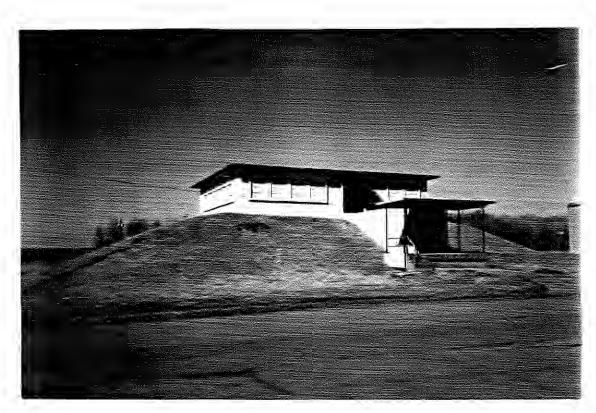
SEAD-72, 4-4-94. View of Building 803, the Mixed Waste Disposal Facility, facing north.
